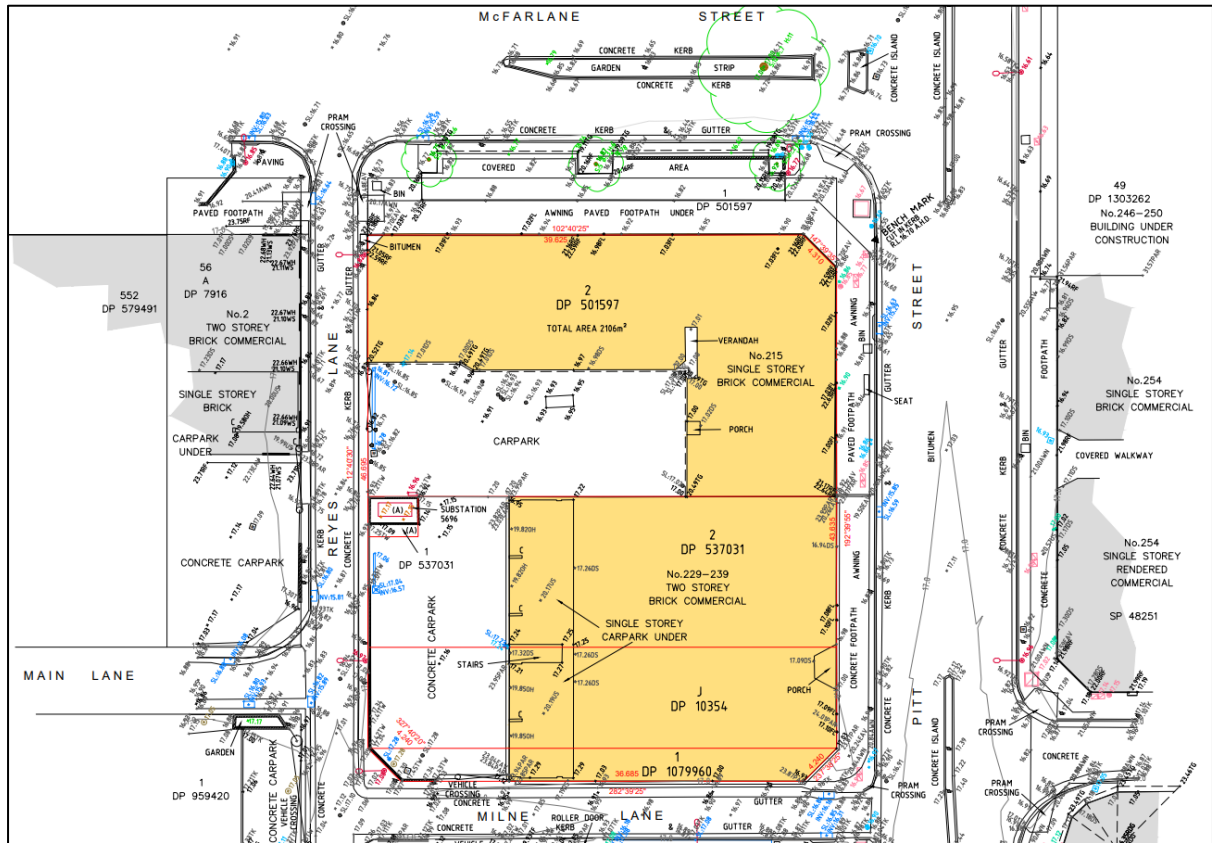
Detailed survey plan (Source: Beveridge Williams, 04 September 2024)
